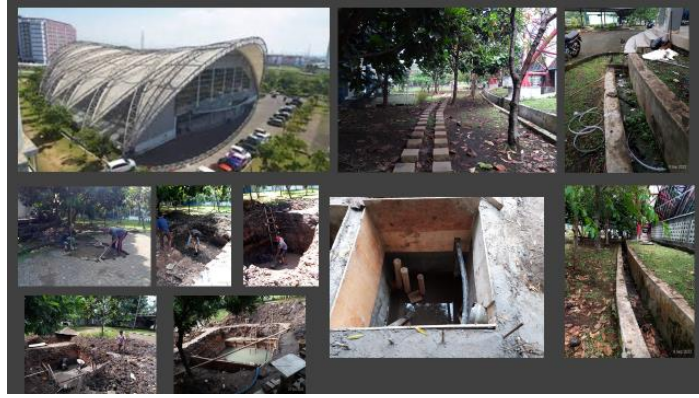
Constructing the second rainwater harvesting system in the Benggala Building area (TUCH).
